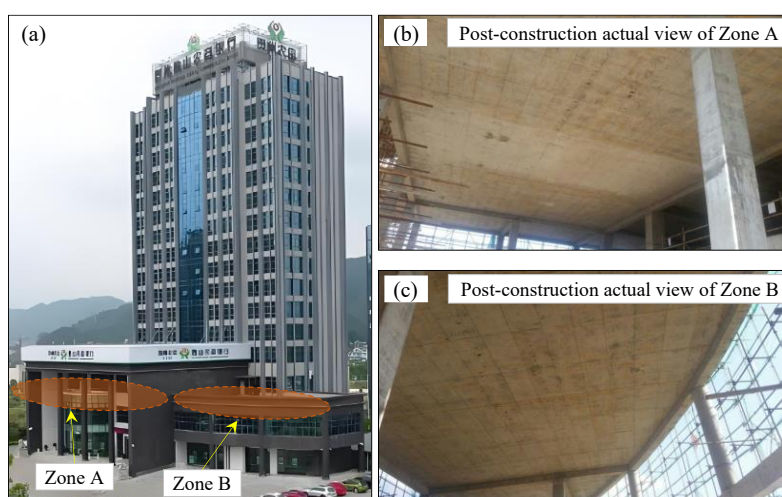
The studied building case: (a) Locations of long-span floor zones, (b) Actual view of Zone A, (c) Actual view of Zone B
